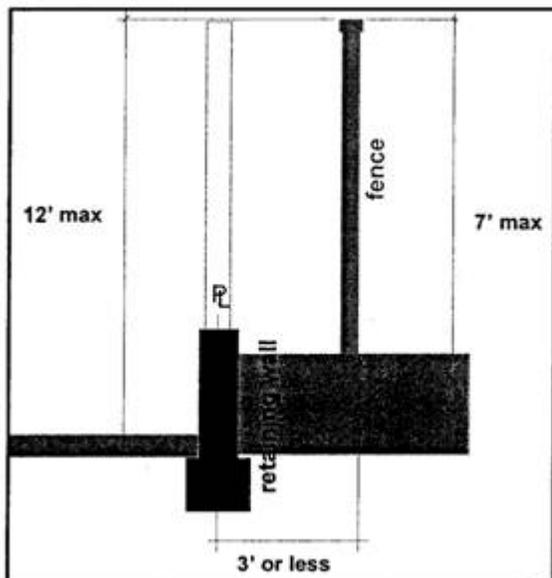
Fence Within Three Feet of Retaining Wall (Adjacent Owner Permission Required)
